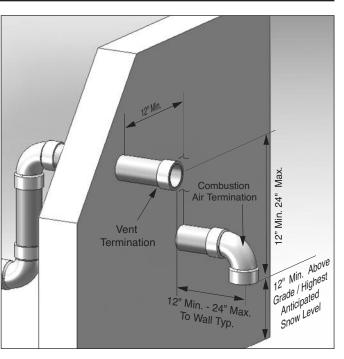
Direct Vent - Alternate Sidewall Termination of Vent and Combustion Air Piping
